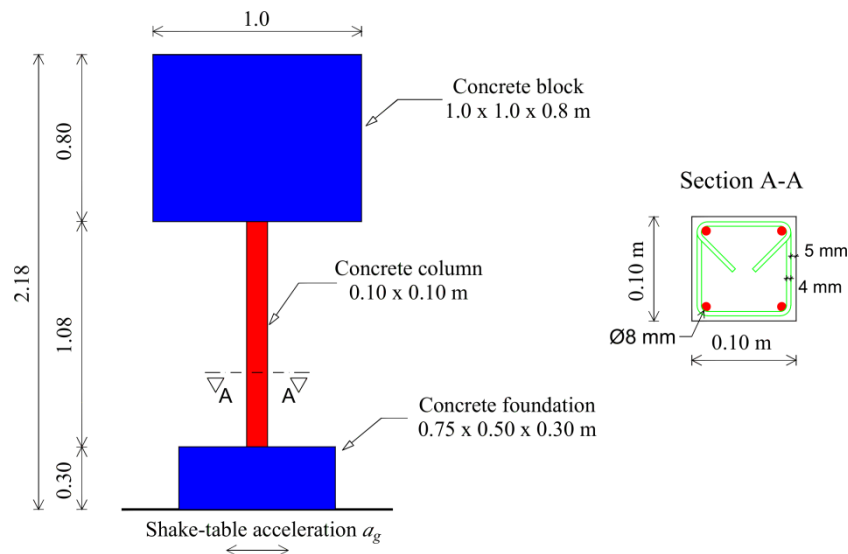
Model of cantilever concrete column tested on aseismic layer ASL-1
